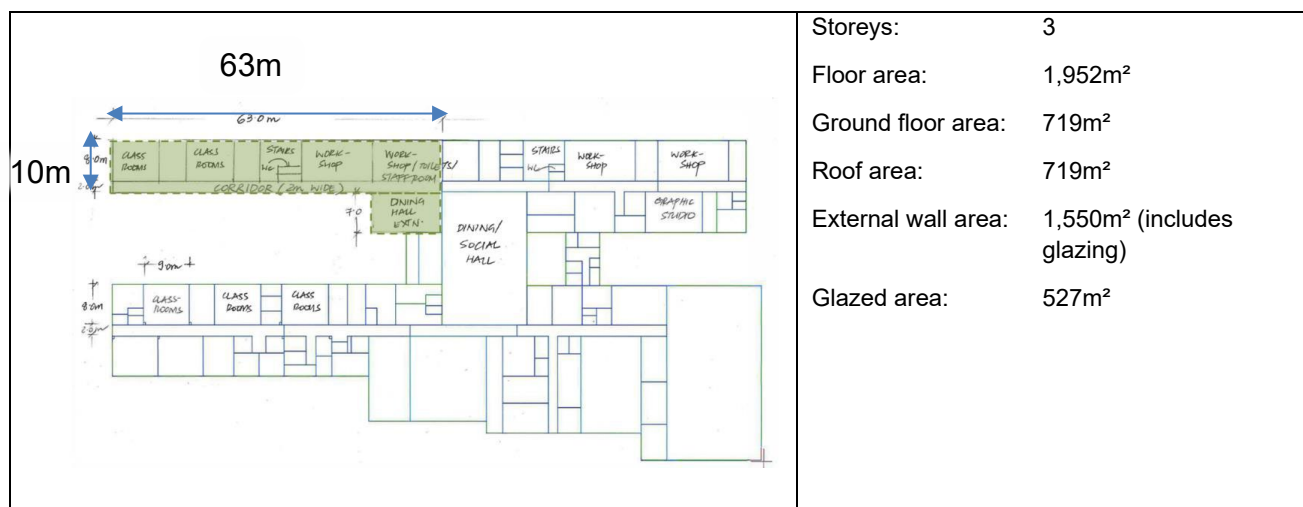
Sketch of the school building form used for the existing building modelling with an extension
